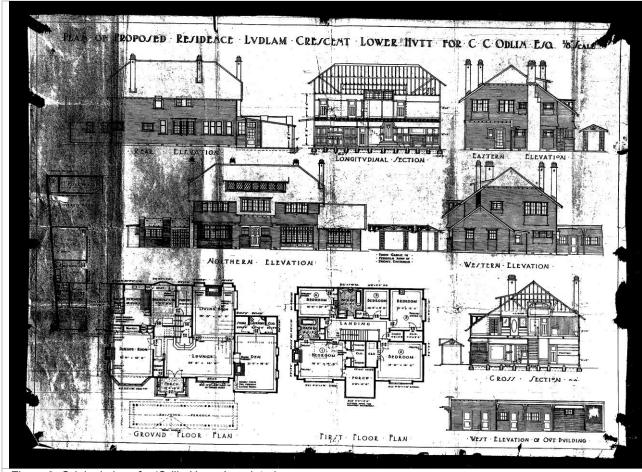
Original plans for 'Odlin House', undated. Source: HCC Archives
